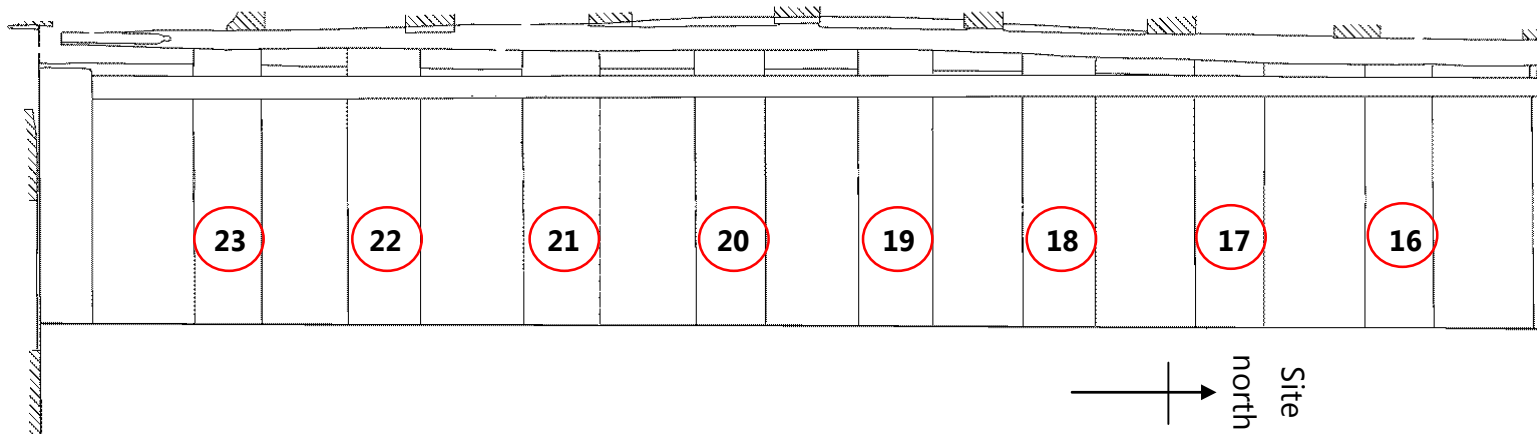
Second-floor frame to show sampled timbers (after Richard Parker, Exeter Archaeology)
